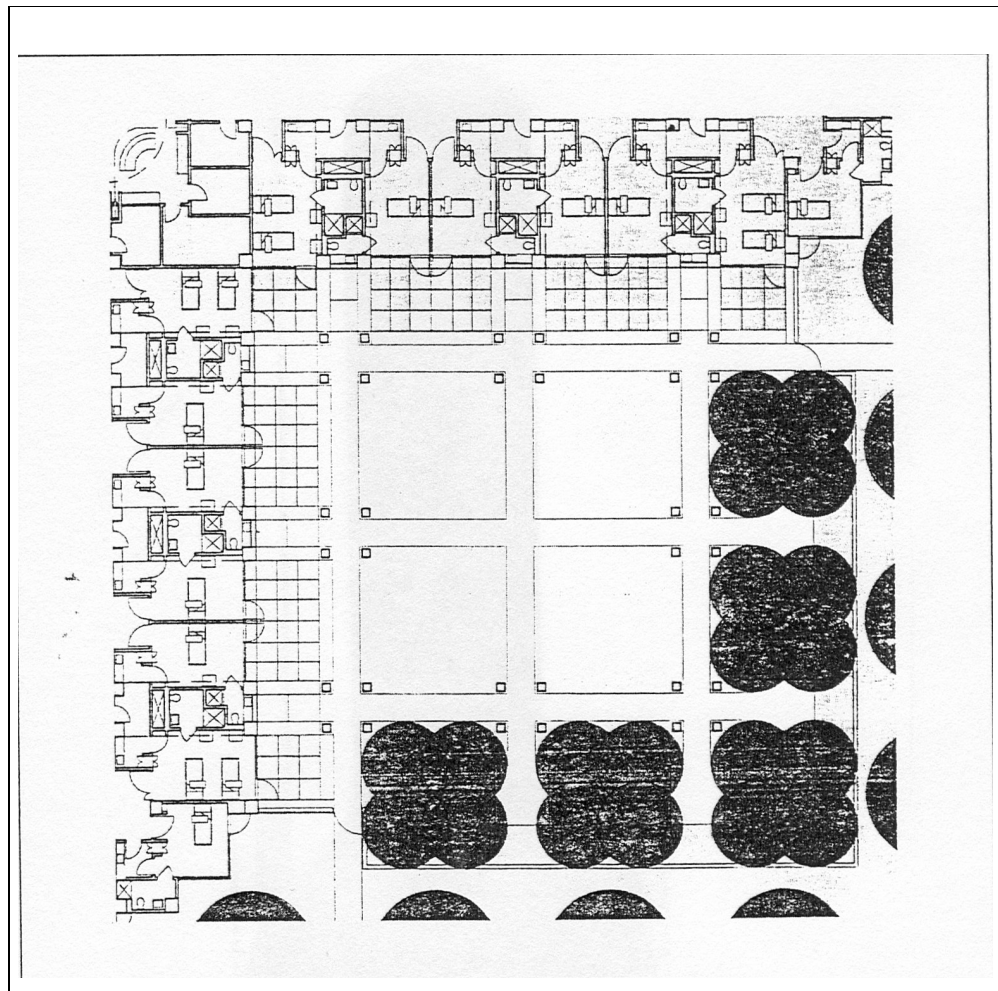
Patient pavilion plan and gardens of City of Hope National Medical Center. (Kliment, 2000, 135).
